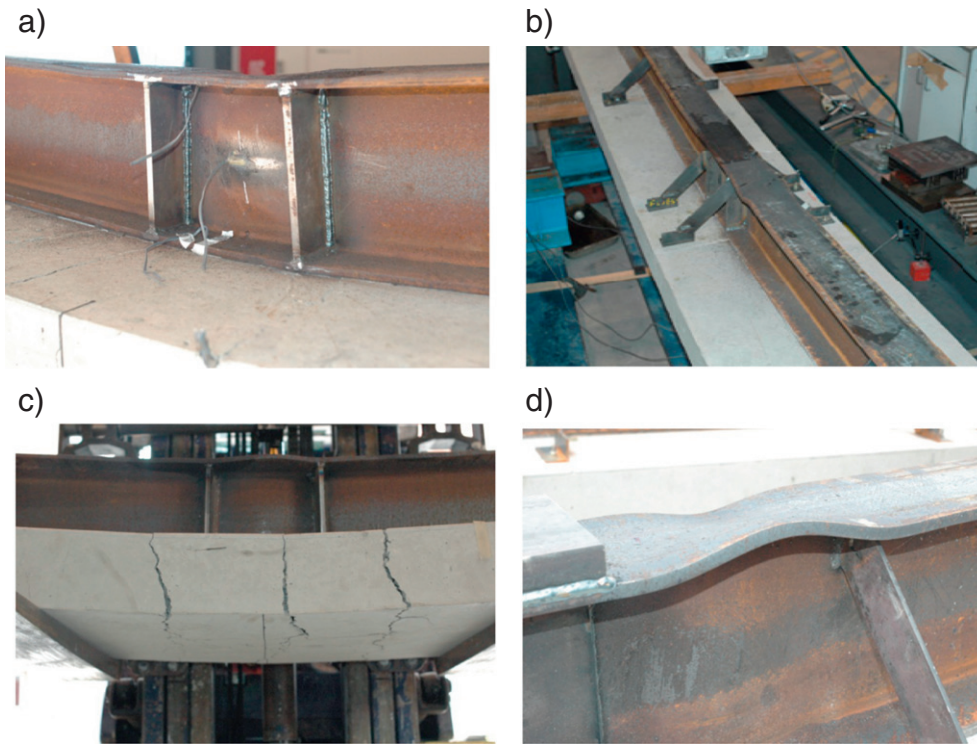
Typical failure modes of the specimens: a) local buckling in the web of CB1; b) flange buckling (CB2); c) cracking of the concrete slab; and d) failure of specimen CB6 immediately after the reinforcing plates.
